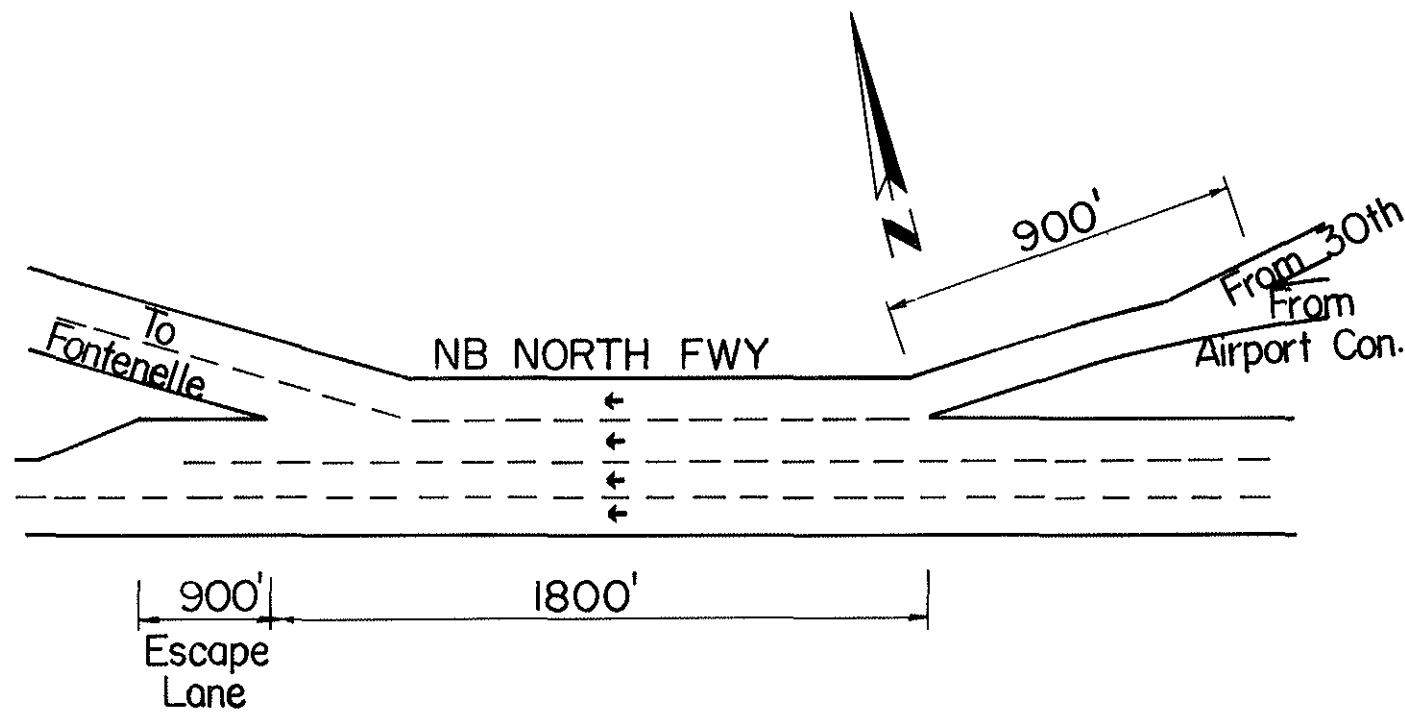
Westbound Weaving Section, Airport Connector/Ames Ramp To Fontenelle, West (31st Ave.) Alignment
